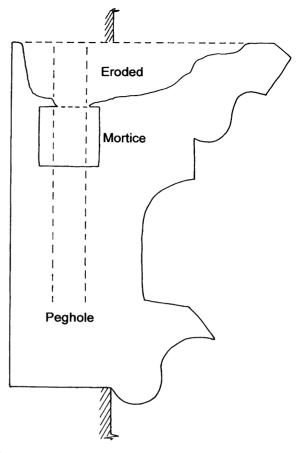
Profile through the wooden cornice in the west tower for the first-floor timber vaulted ceiling.
